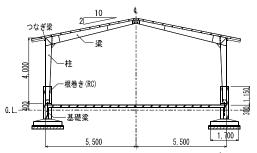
Sectional Plan of the Practical Factory (Unit [mm])
